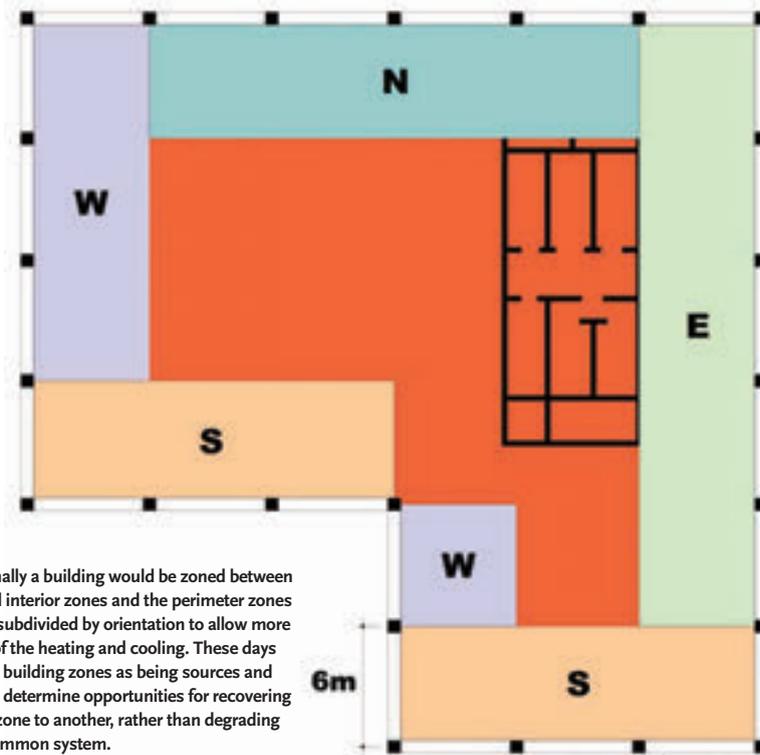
Traditionally a building would be zoned between the perimeter and interior zones and the perimeter zones would be further subdivided by orientation to allow more effective control of the heating and cooling. These days we should look at building zones as being sources and sinks of energy to determine opportunities for recovering energy from one zone to another, rather than degrading the energy in a common system.
